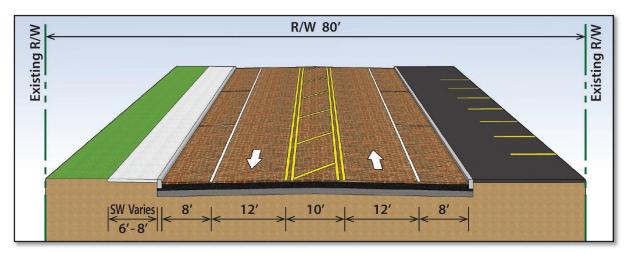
Existing Typical Section - Whiting Street - Selmon Expressway (SR 618) to North Brush Street
